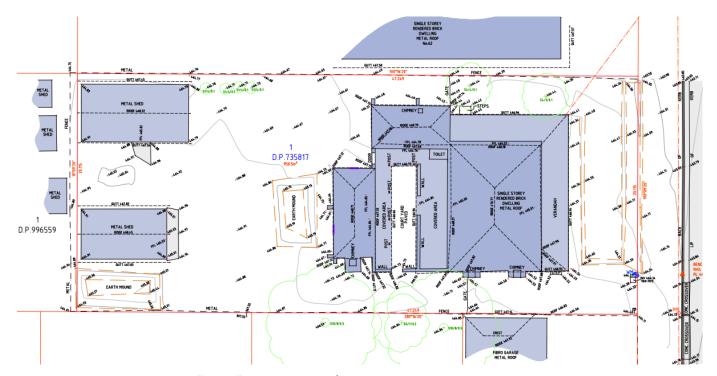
Exisiting Site showing "House" and outbuildings/sheds at 64 Lawson St, Mudgee
